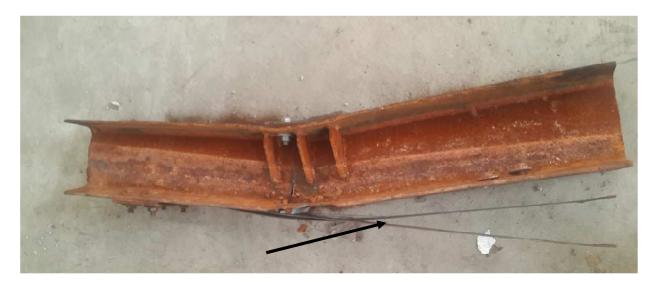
h): Beam 9 after test showing mode of failure CFRP tensile rupture along with End Anchorage Failure
